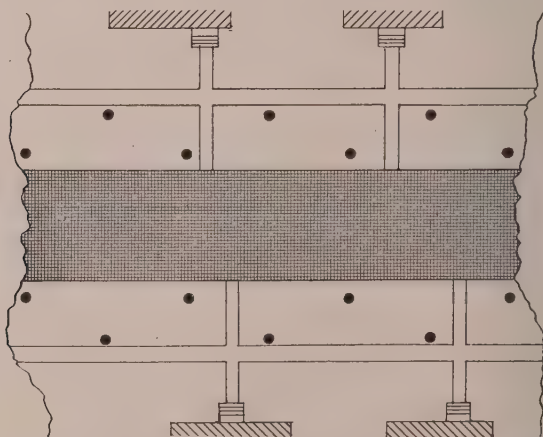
Plan of modern avenue provided with a 40-foot roadbed, 6-foot sidewalks, 23-foot tree belts, with alternating rows of trees 60 feet apart.
